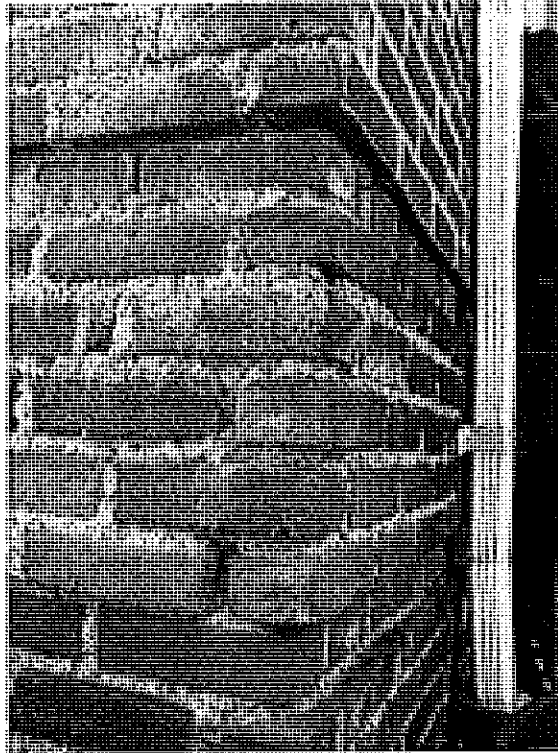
Poor condition of exterior bricks which allow water infiltration throughout the building
